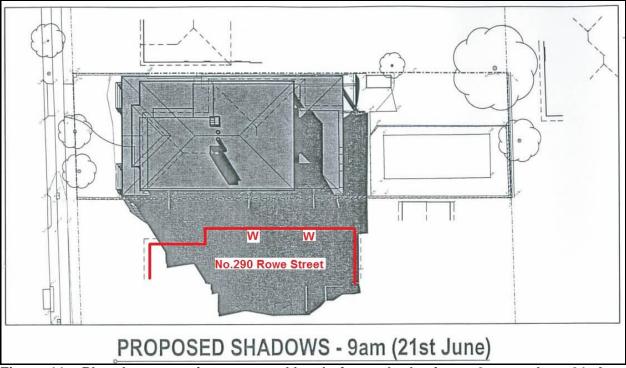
Plan demonstrating proposed level of overshadowing at 9am on June 21. As can be seen the eastern facing side windows are overshadowed at 9am on June 21 (winter solstice).
